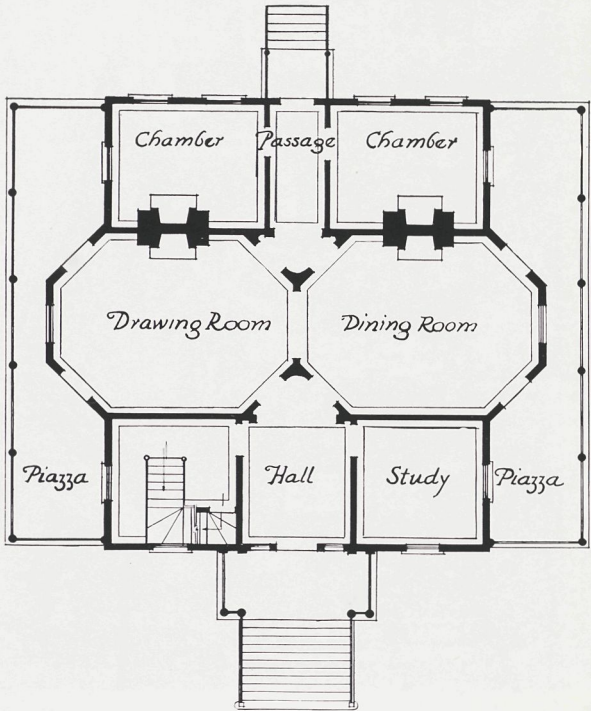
The main floor plan as restored with portico correctly located and the original entrance hall and stair hall reconstituted
